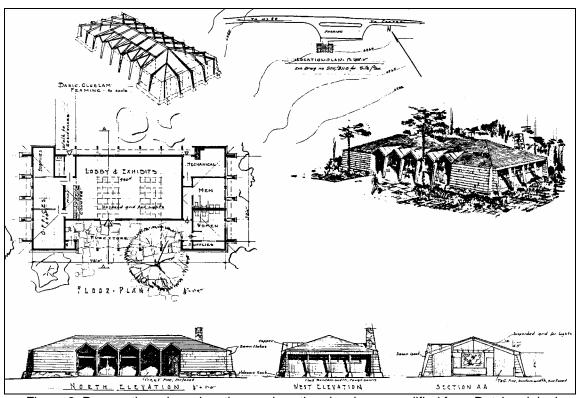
Perspective, plan, elevation, and section drawings - modified from Doty's original designs (NPS 1965).
